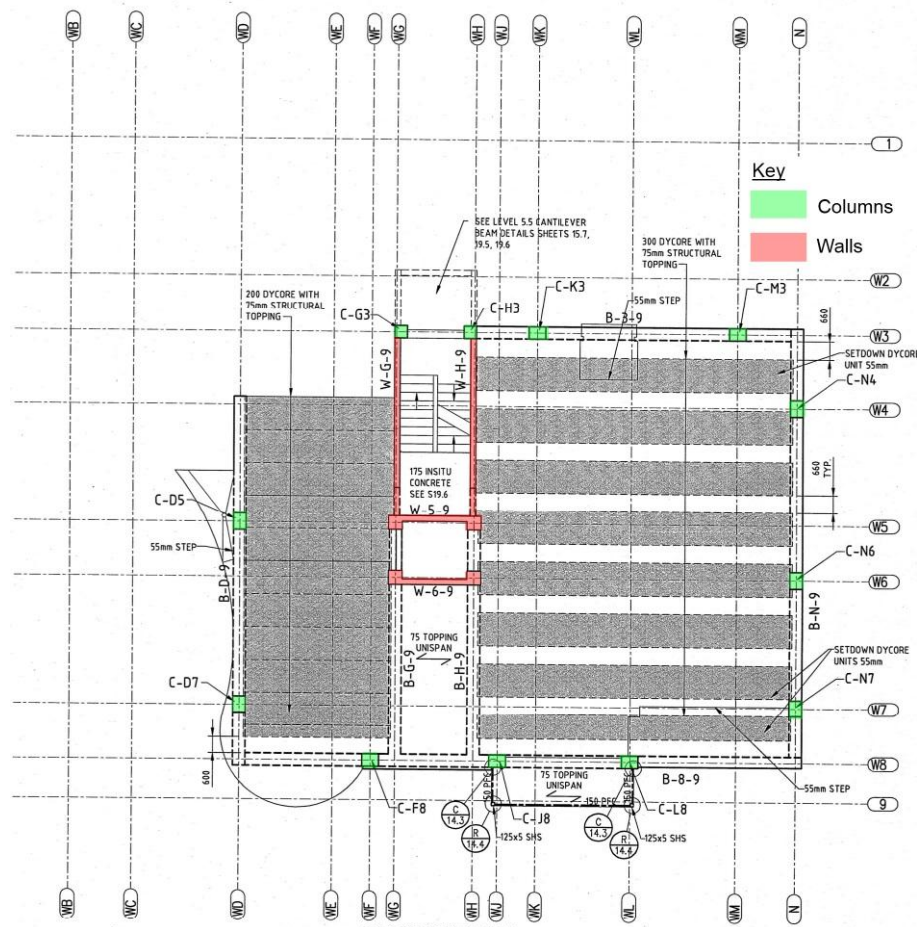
Ground floor plan of Victoria Square Apartments building
